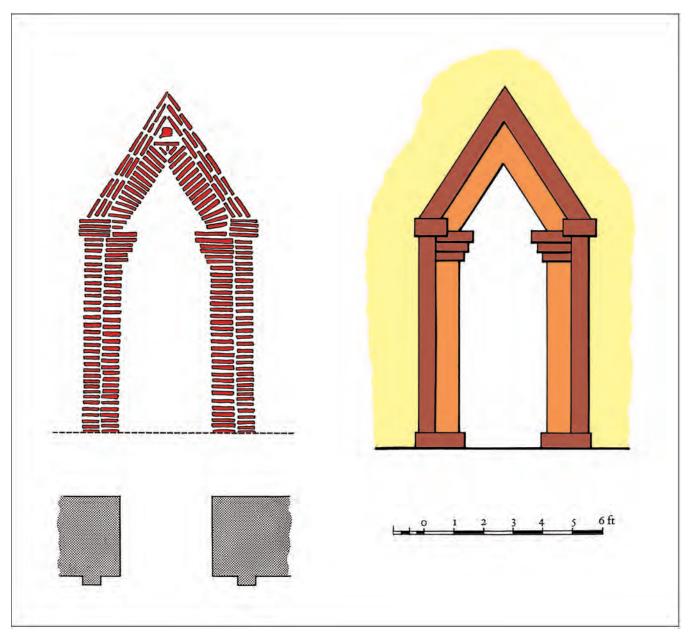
Holy Trinity, Colchester (Essex). West doorway of tower, constructed entirely from reused Roman bricks. Left, external elevation, drawn by H.M. Taylor (adapted). Right, reconstruction of the intended appearance of the doorway when encased in stucco. Drawings: Taylor and Taylor 1965; Warwick Rodwell
